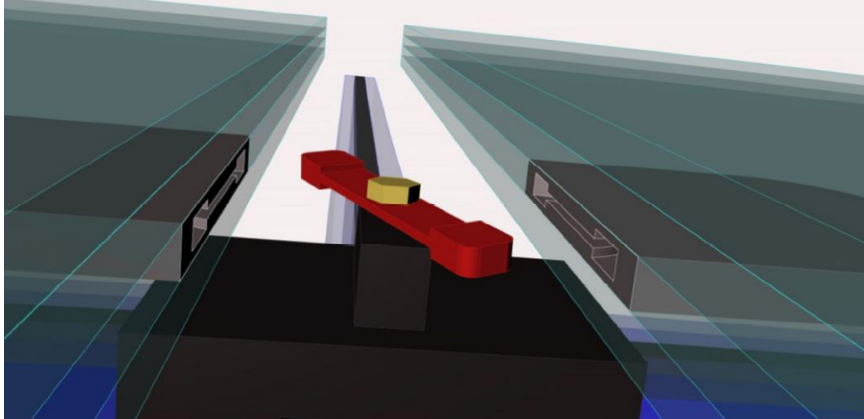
Propeller like connection to fix the bridge deck panels to the main beams.
